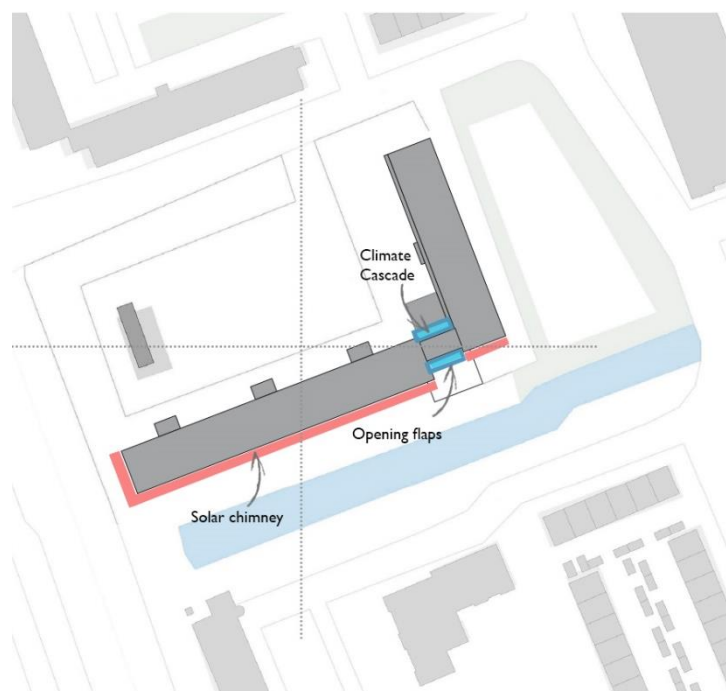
Site zoning for EWF. Site plan source: Heeswijk architecten
